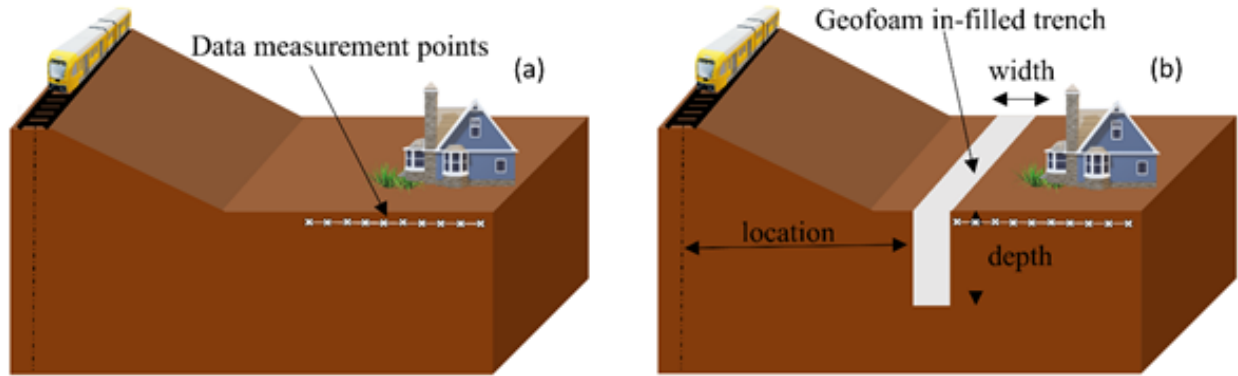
Railway embankment models (a) without trench (b) with EPS geofoam in-filled trench
